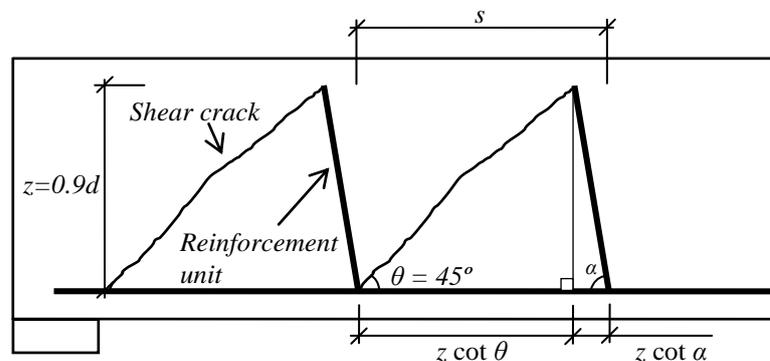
Truss model used in the derivation of maximum longitudinal distance between shear reinforcement units.
